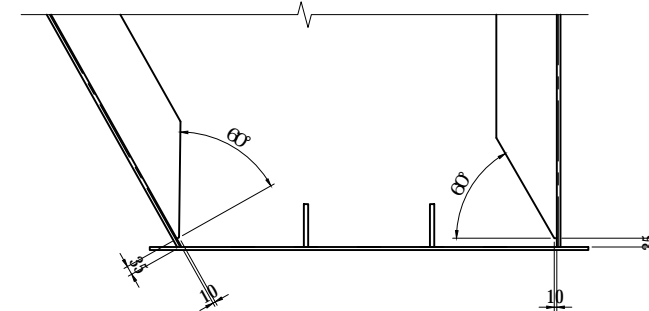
## DETAIL FOR NOTCH GEOMETRY OF VERTICAL STIFFENER
